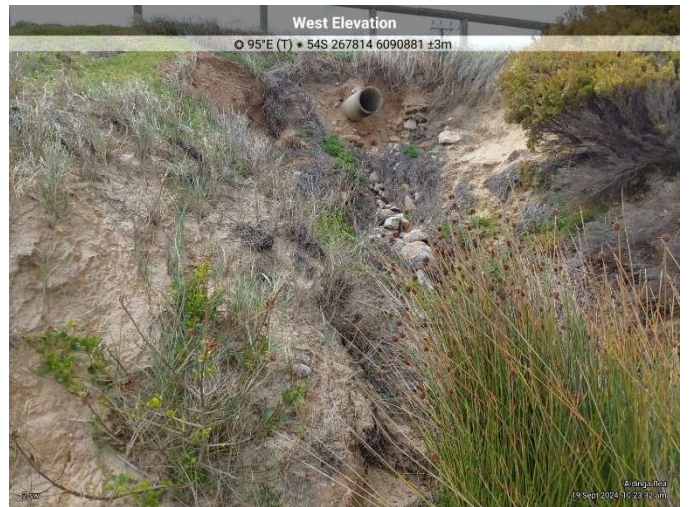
(above right) Stormwater outlet with erosion beneath
